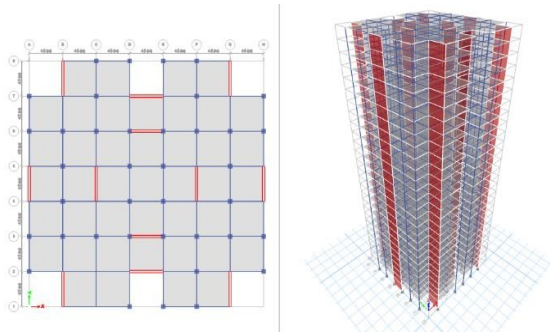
Plan of Structure Side Shear Wall (Model 6)
